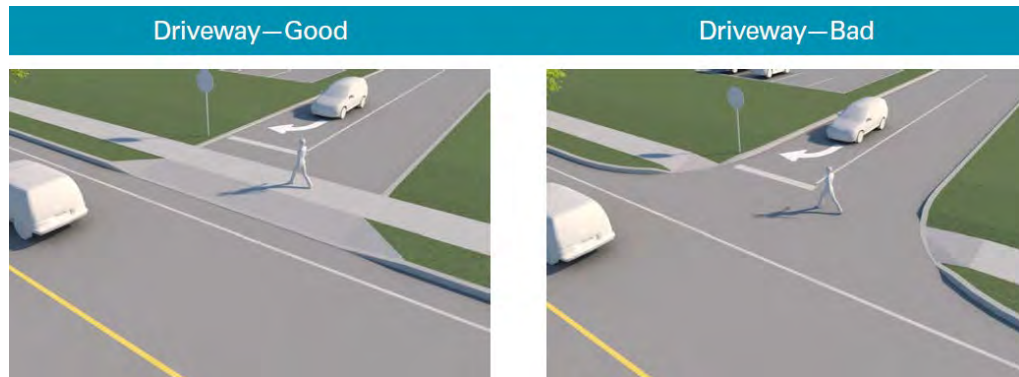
Sidewalk and Driveways (Source: CSDG)
